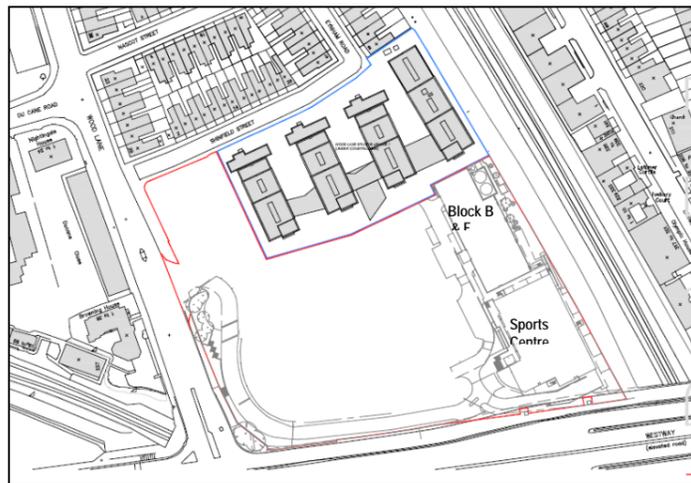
Current Site Layout including Wood Lane Studios at Imperial West Development
